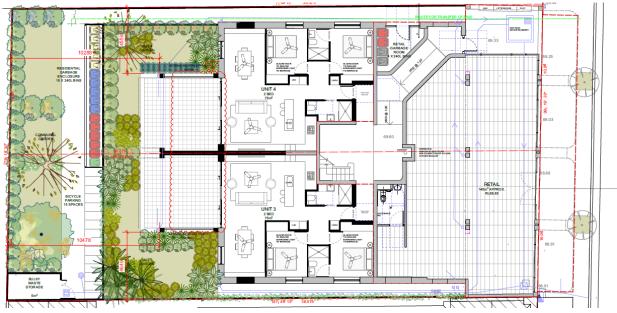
Proposed Ground Floor Plan under DA-80/2023. (Source: SHED, 2023)
